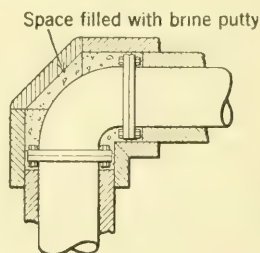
Insulation Flanged Ell of Large Size, with Cover.
